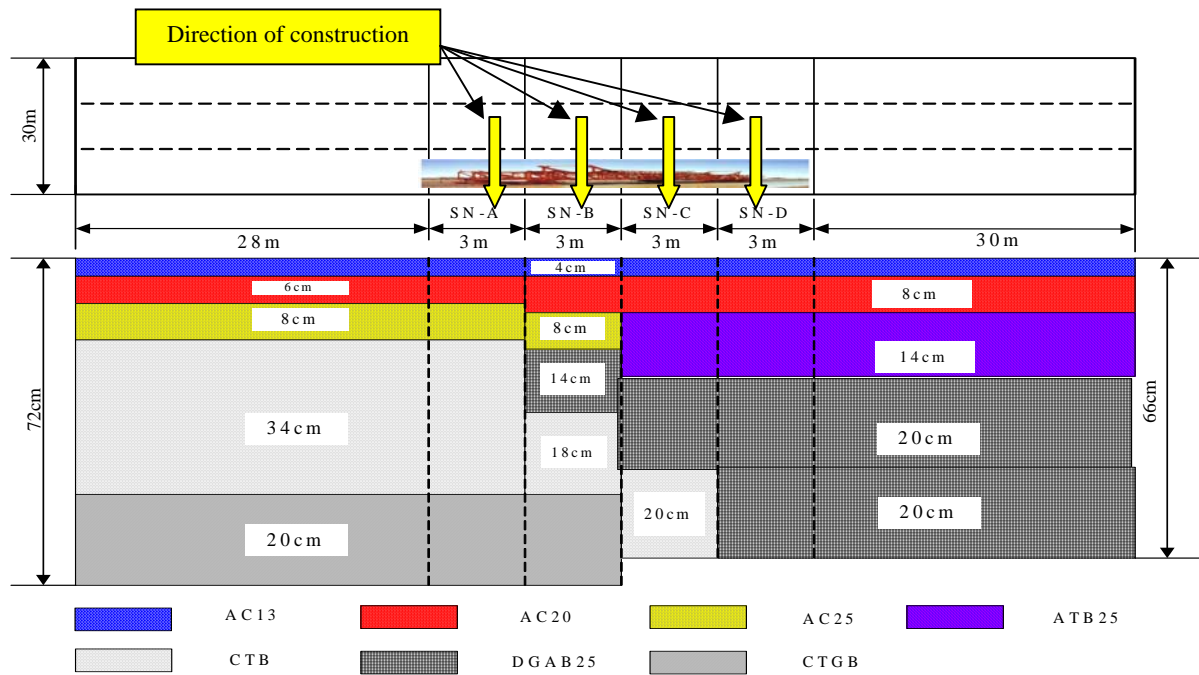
Arrangement plan and structure for accelerated loading test sections of full-scale pavements
